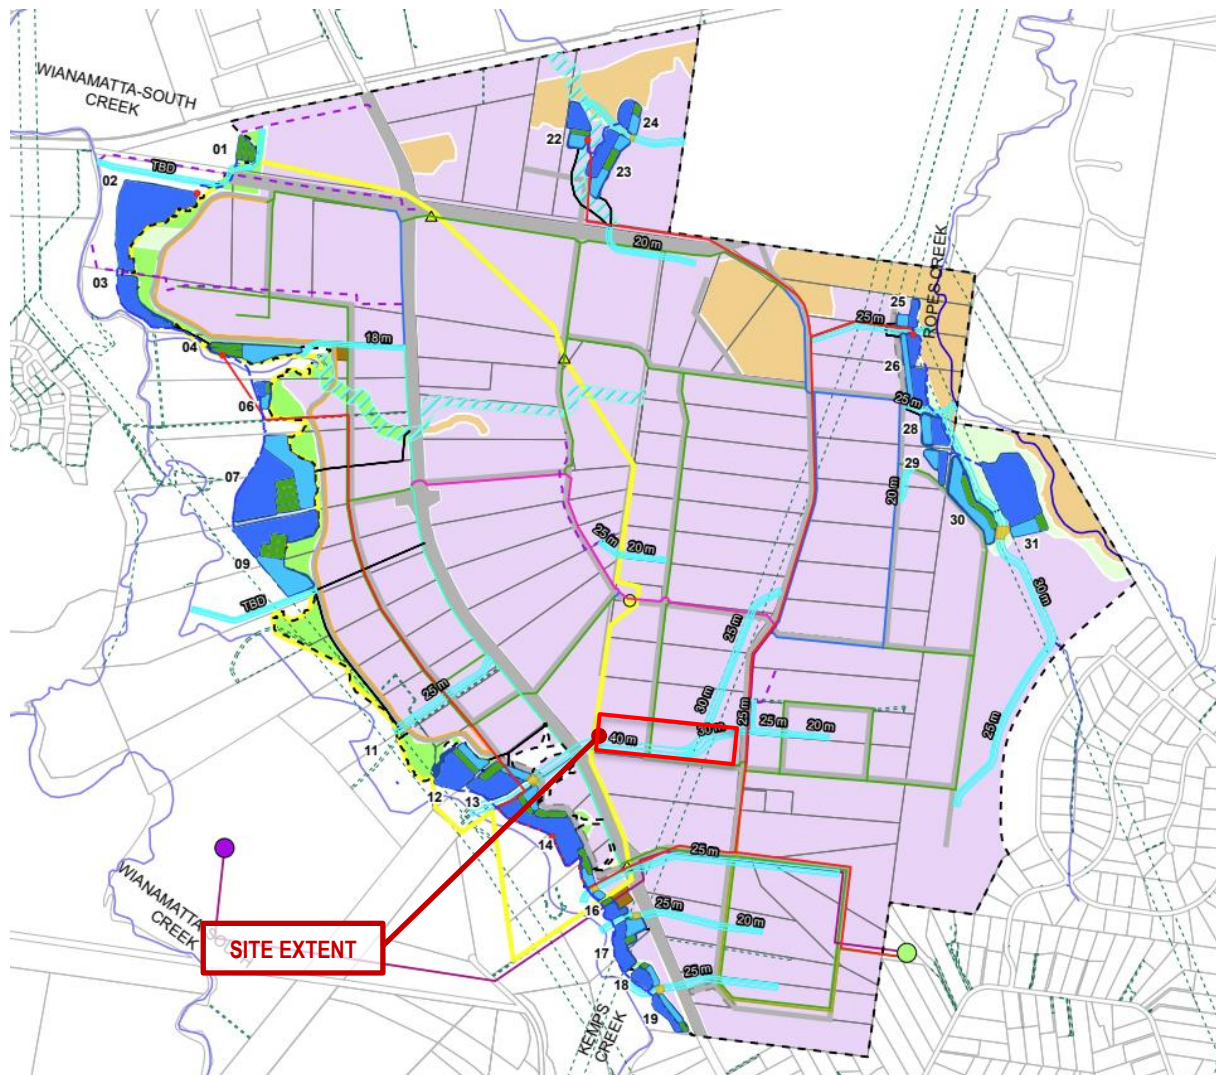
Mamre Road Precinct Stormwater Scheme Plan (Mayc 2024, Sydney Water)
